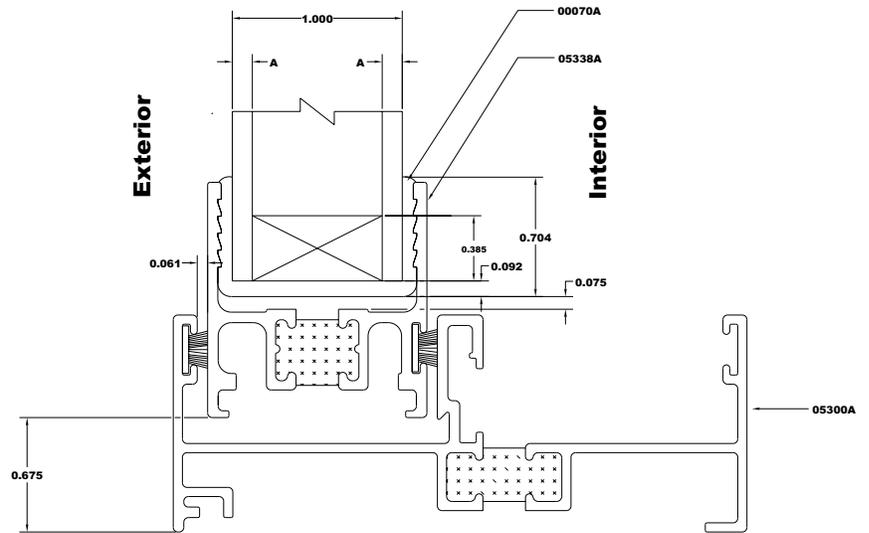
Fixed Jamb Drawing for Horizontal Aluminum Slider.
